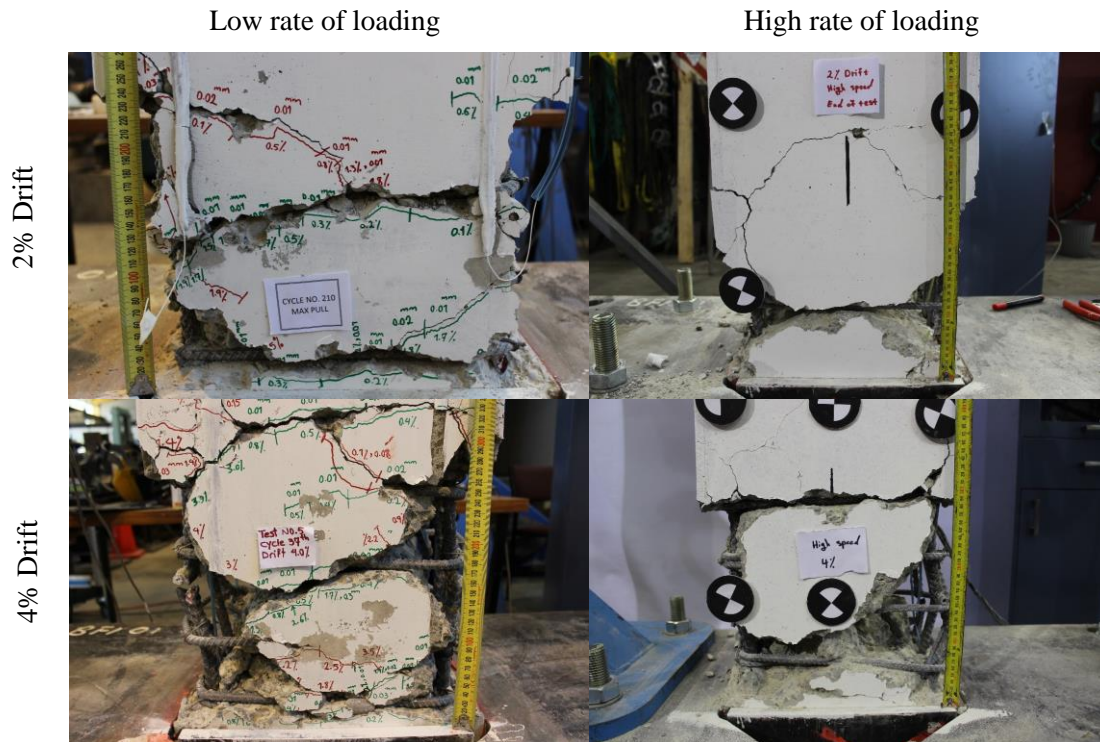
Failure modes and cracking pattern of specimens at failure
